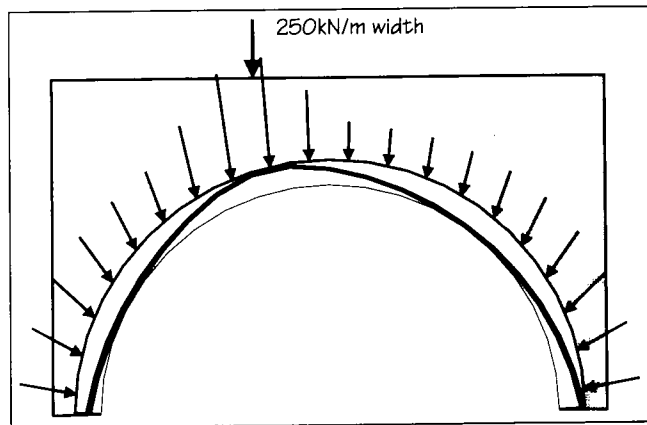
Fill exerting at-rest horizontal pressure for bridge at Bargower.
